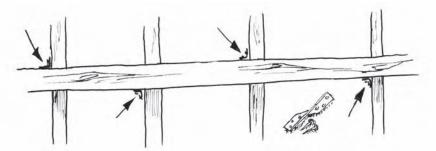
Plan view of joist straps at the junction of the hanger and ceiling joists
